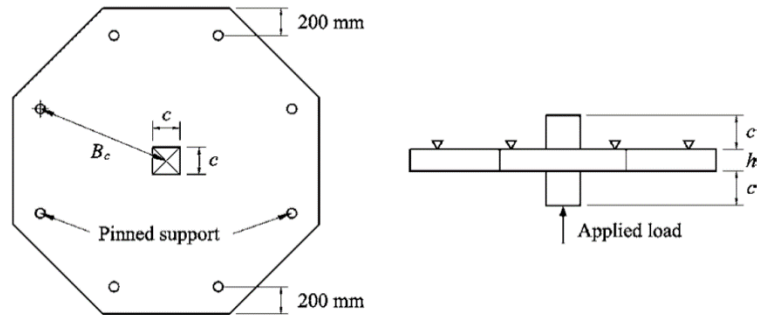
Layout of Test Slabs, Birkle and Dilger (2008)
